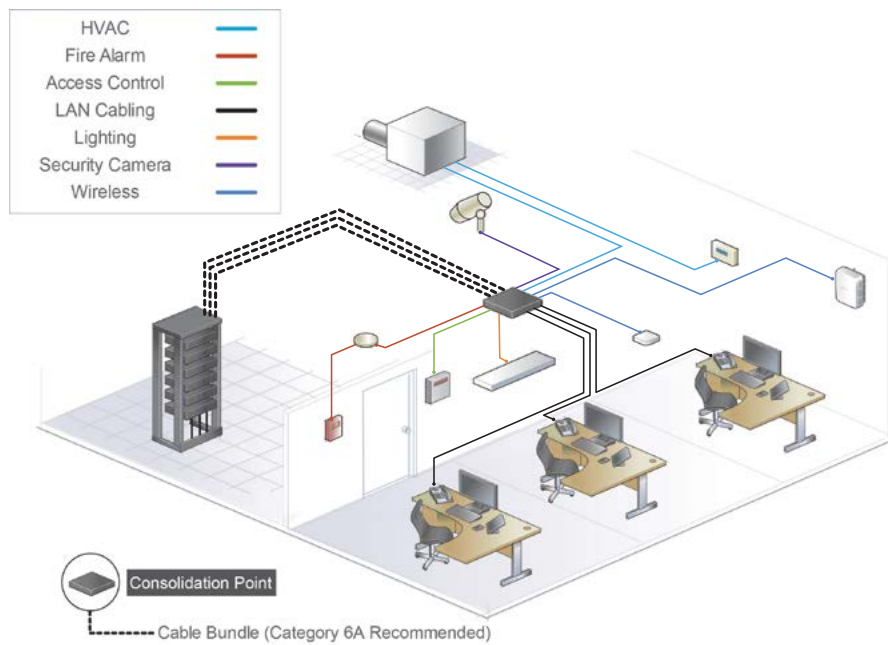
The Universal Connectivity Grid uniting all work station and ceiling-based application cabling through a consolidation point
